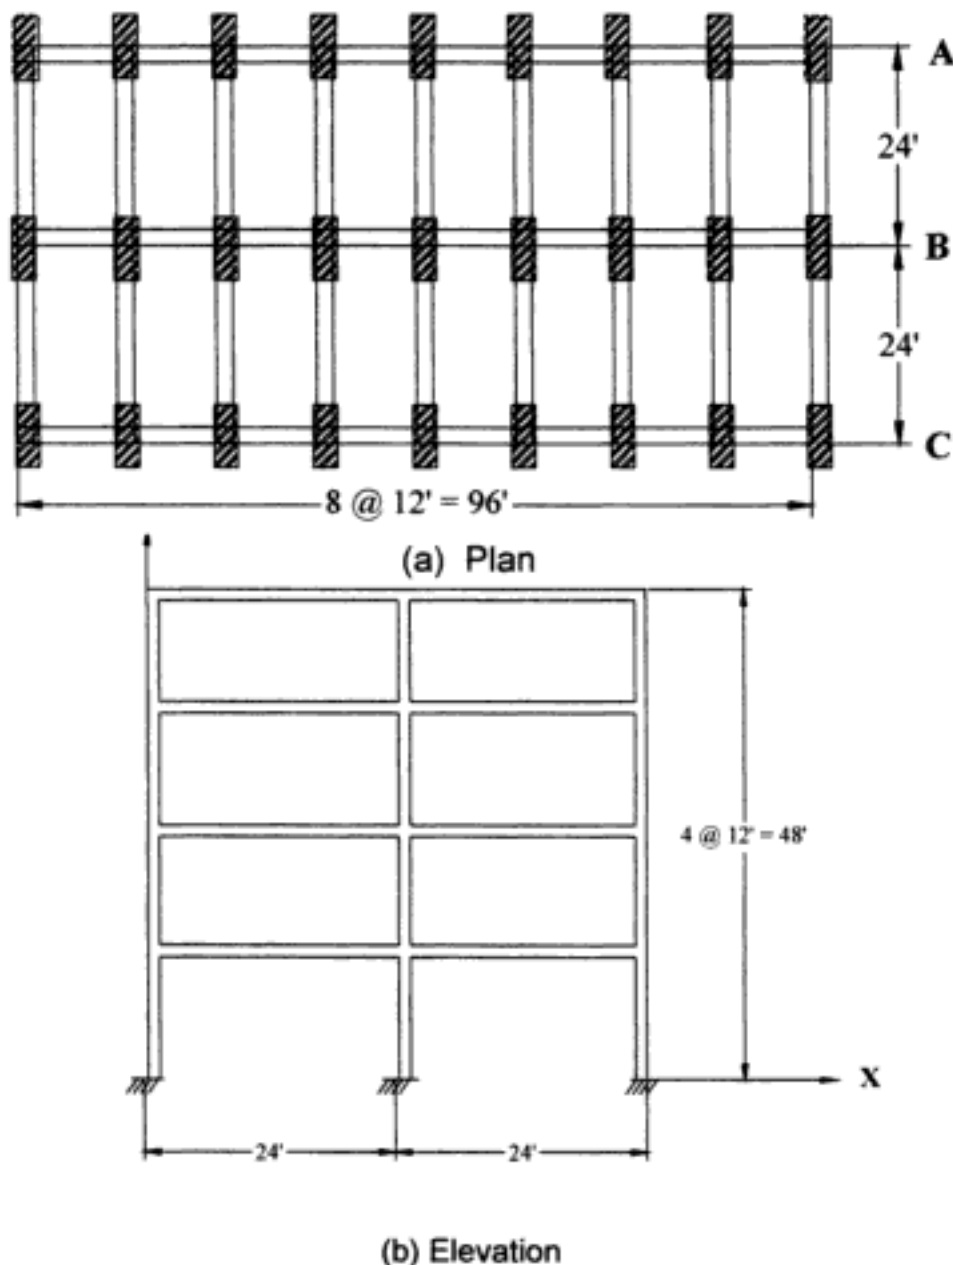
Plan and elevation for a four-story building of Illustrative Example 23.1.
